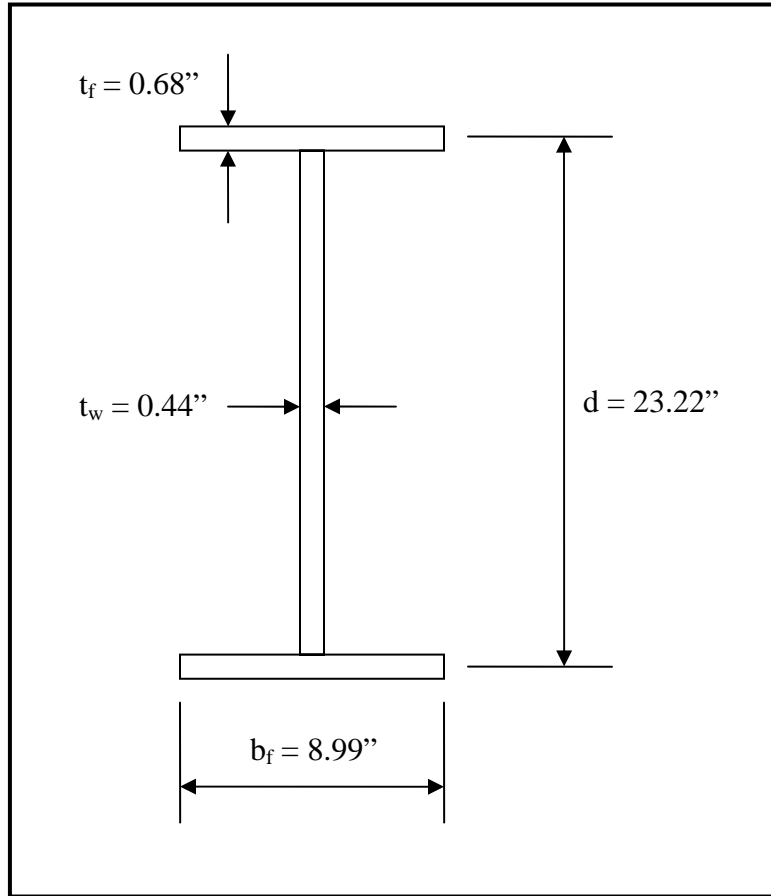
Cross-sectional geometry of basic W24x76 girder [[AISC, 2004](#)].
